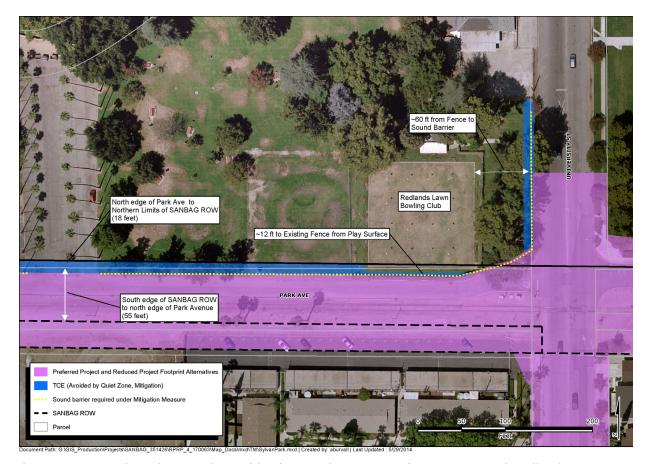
Sound Barrier Locations with Distances between Barrier Segments and Redlands Lawn Bowling Club Green.
